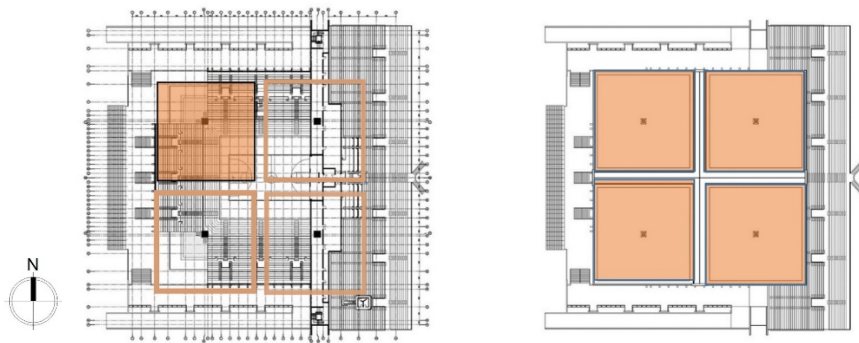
Roof layout showing a four-square roof covered indoor arena and outdoor audience's seat of the main building.
